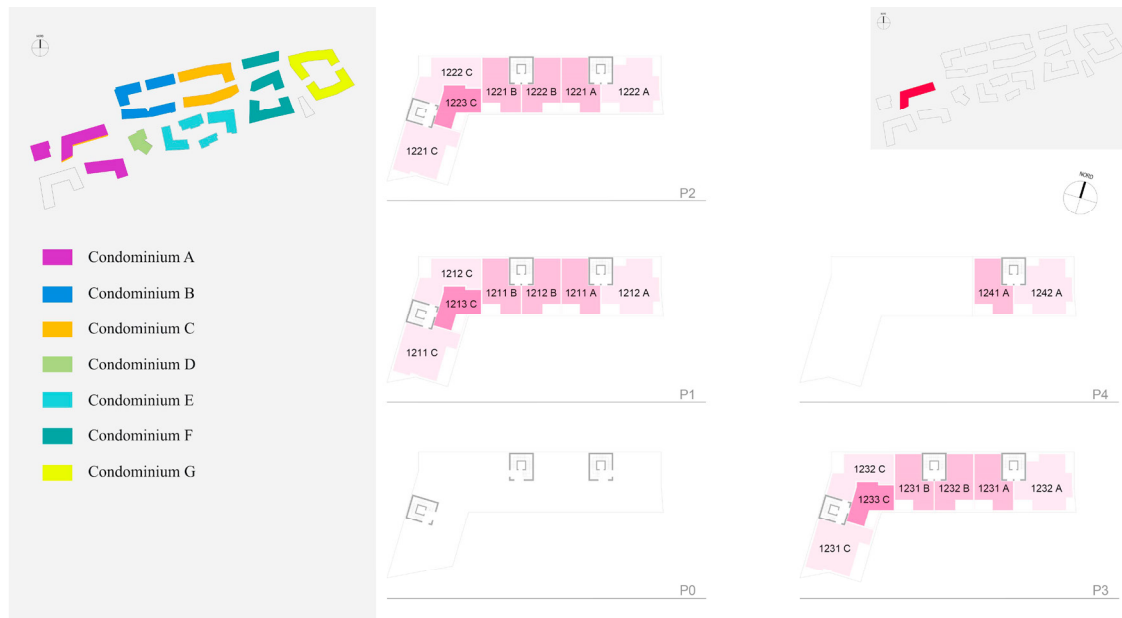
Plan type of an apartment block of Condominium A. Each apartment building has one or more stairwells that serve more flats.
